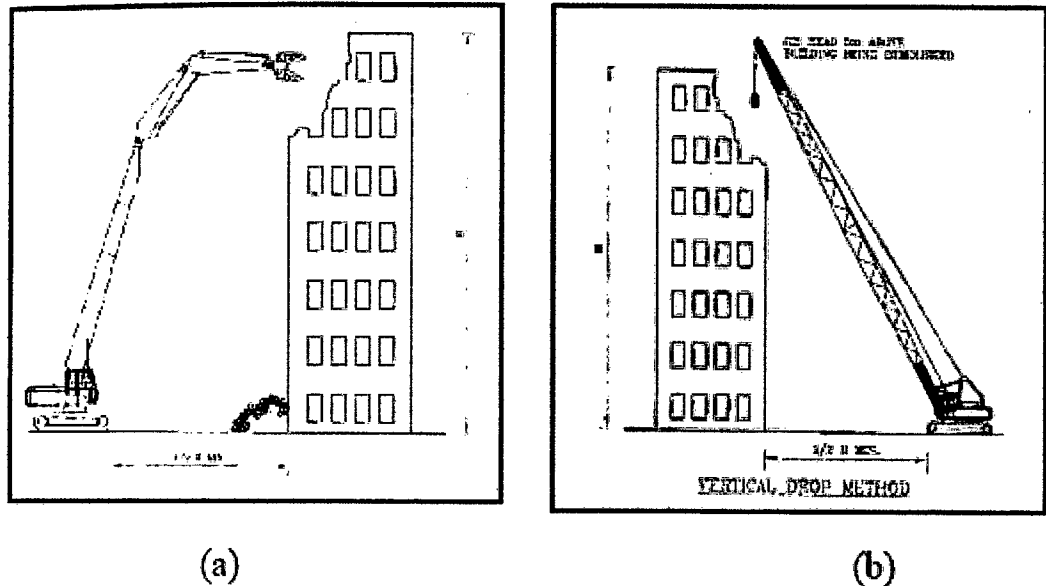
Top-down method using machine mounted with hydraulic attachments.
